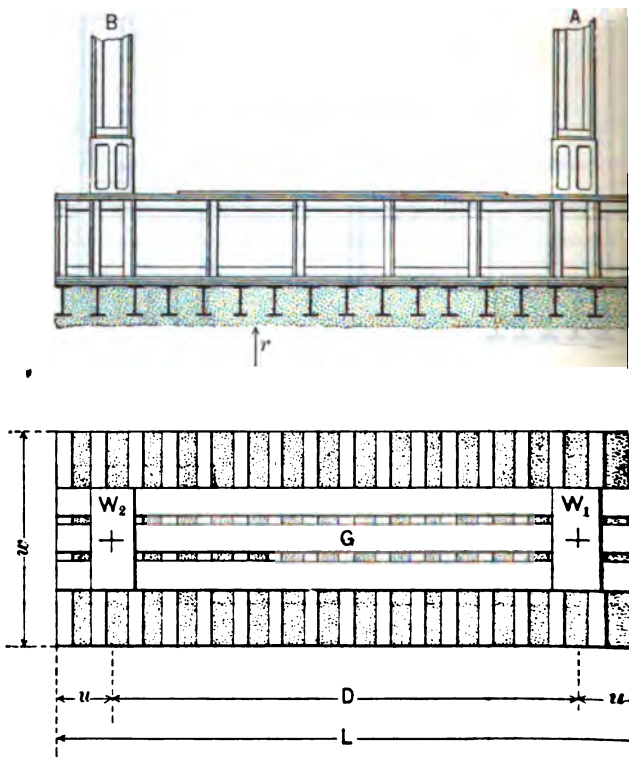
Girdering-method of Foundations. Two Equal Loads
